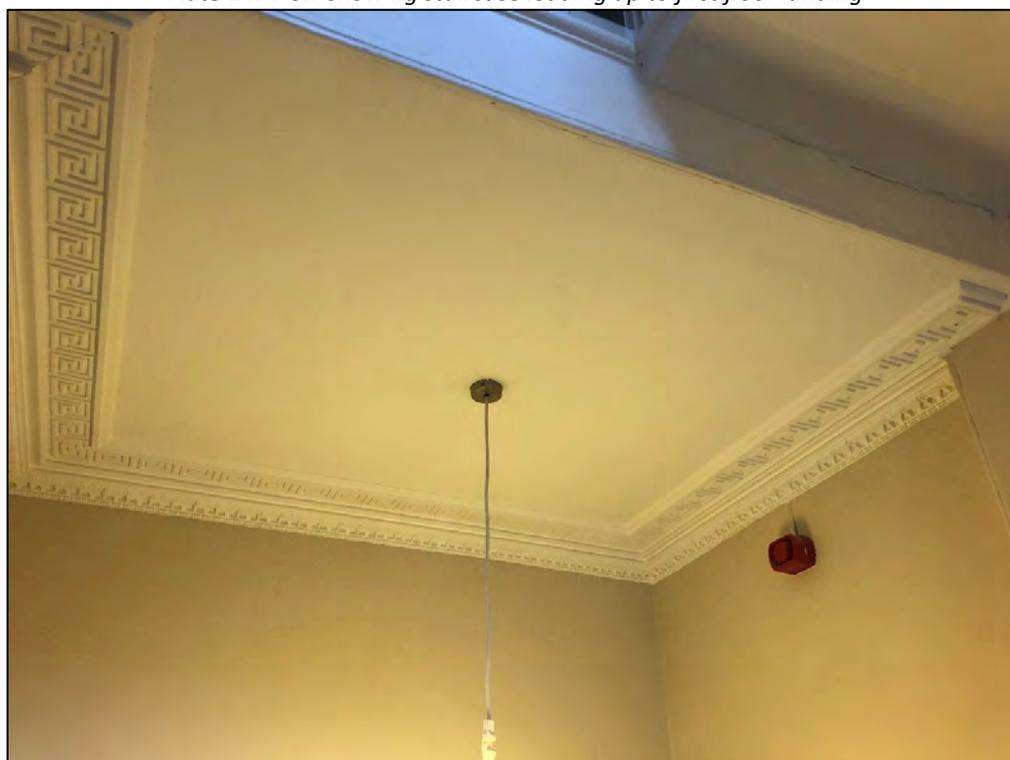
View looking W showing detail of cornice and ceiling frieze on first floor landing
